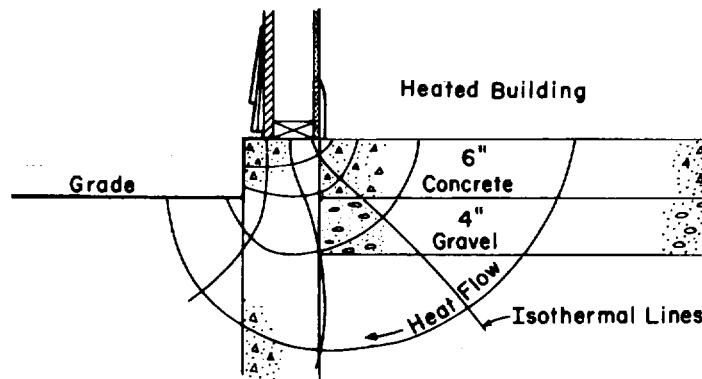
Flow net, concrete slab on grade, uninsulated⁴¹.
